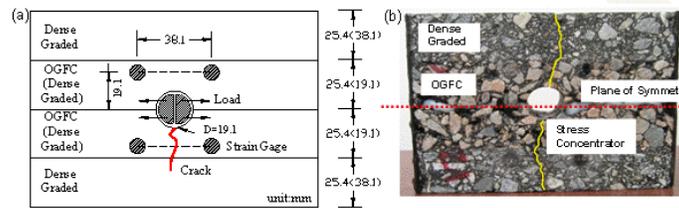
(a) Specimen loading and measurement system and (b) cracking mechanism.
